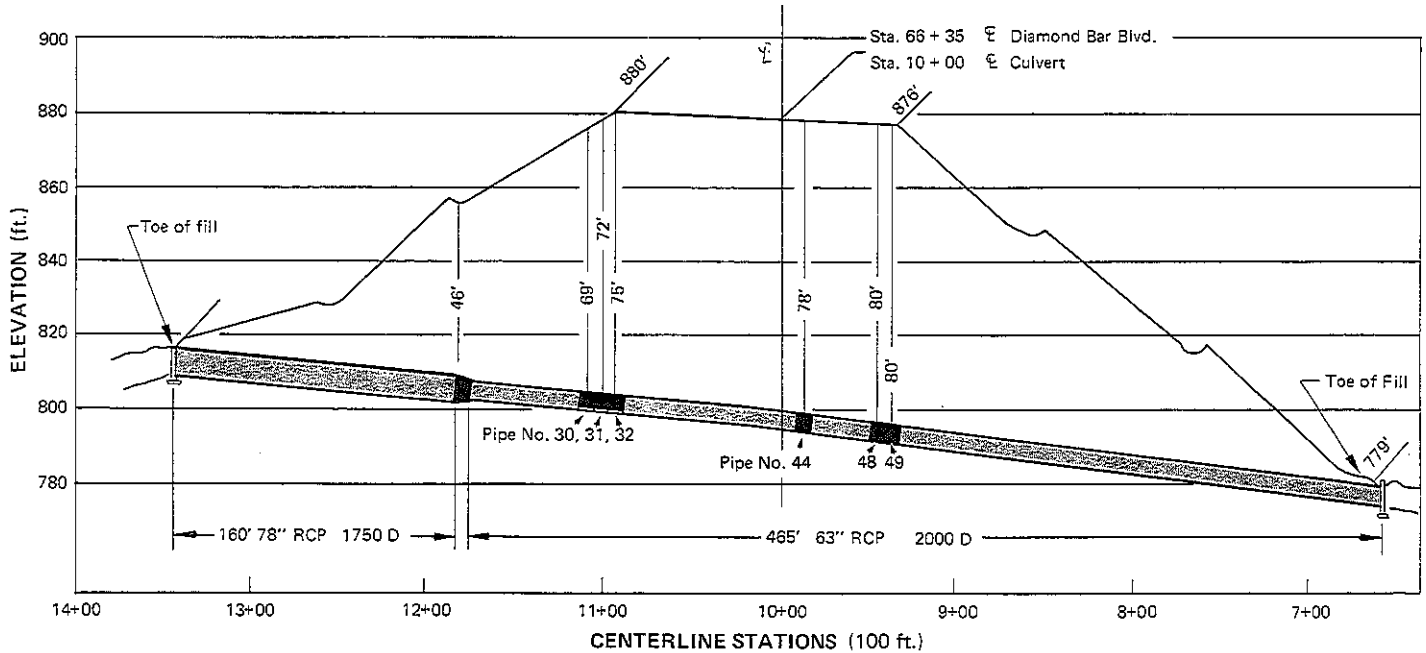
DIAMOND BAR BOULEVARD — CULVERT PIPE PROFILE VIEW.
